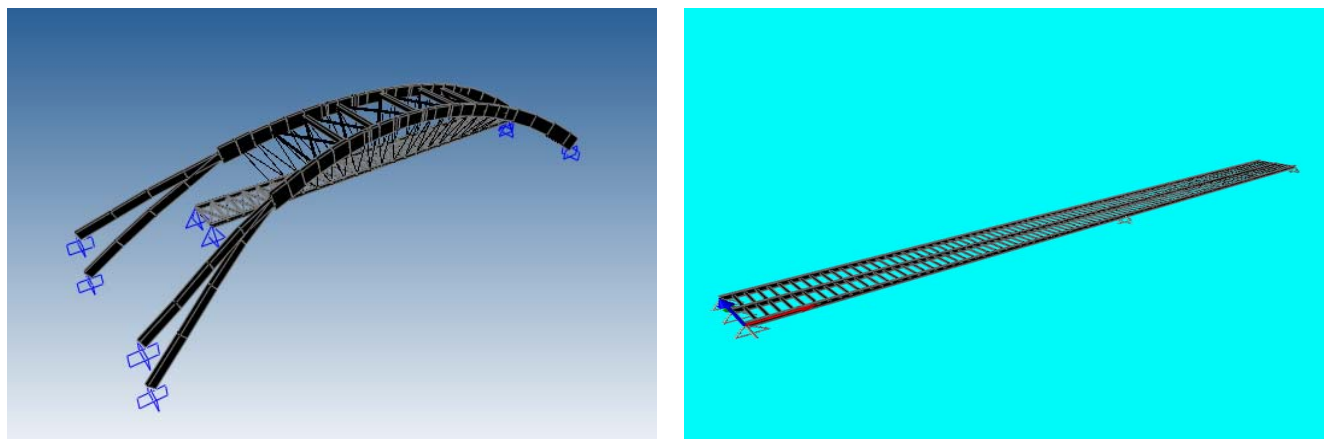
Finite Element model (Solid Element) of Footbridge-I. Figure 7: Finite Element model (Solid Element) of Footbridge-II.
